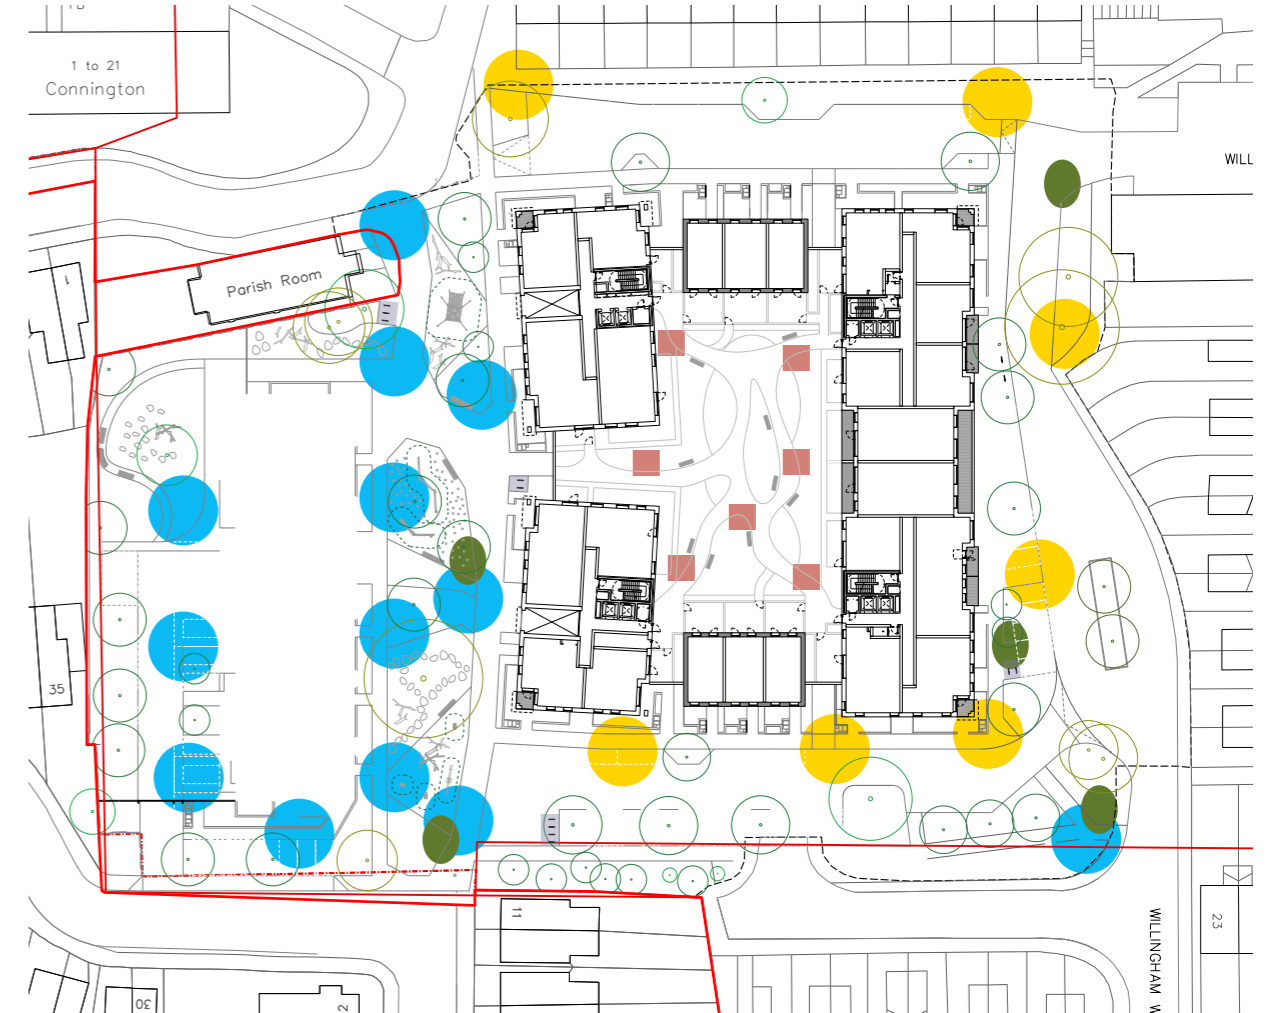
Buildings B and E lighting and street furniture: key plan
